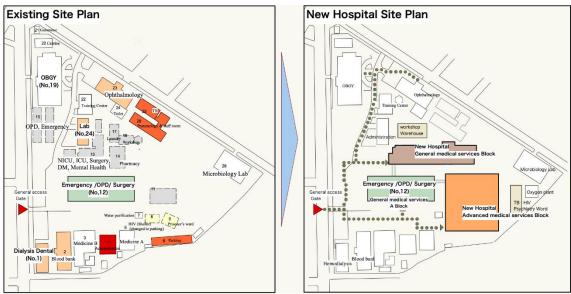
Siem Reap Provincial Hospital Site Plan
